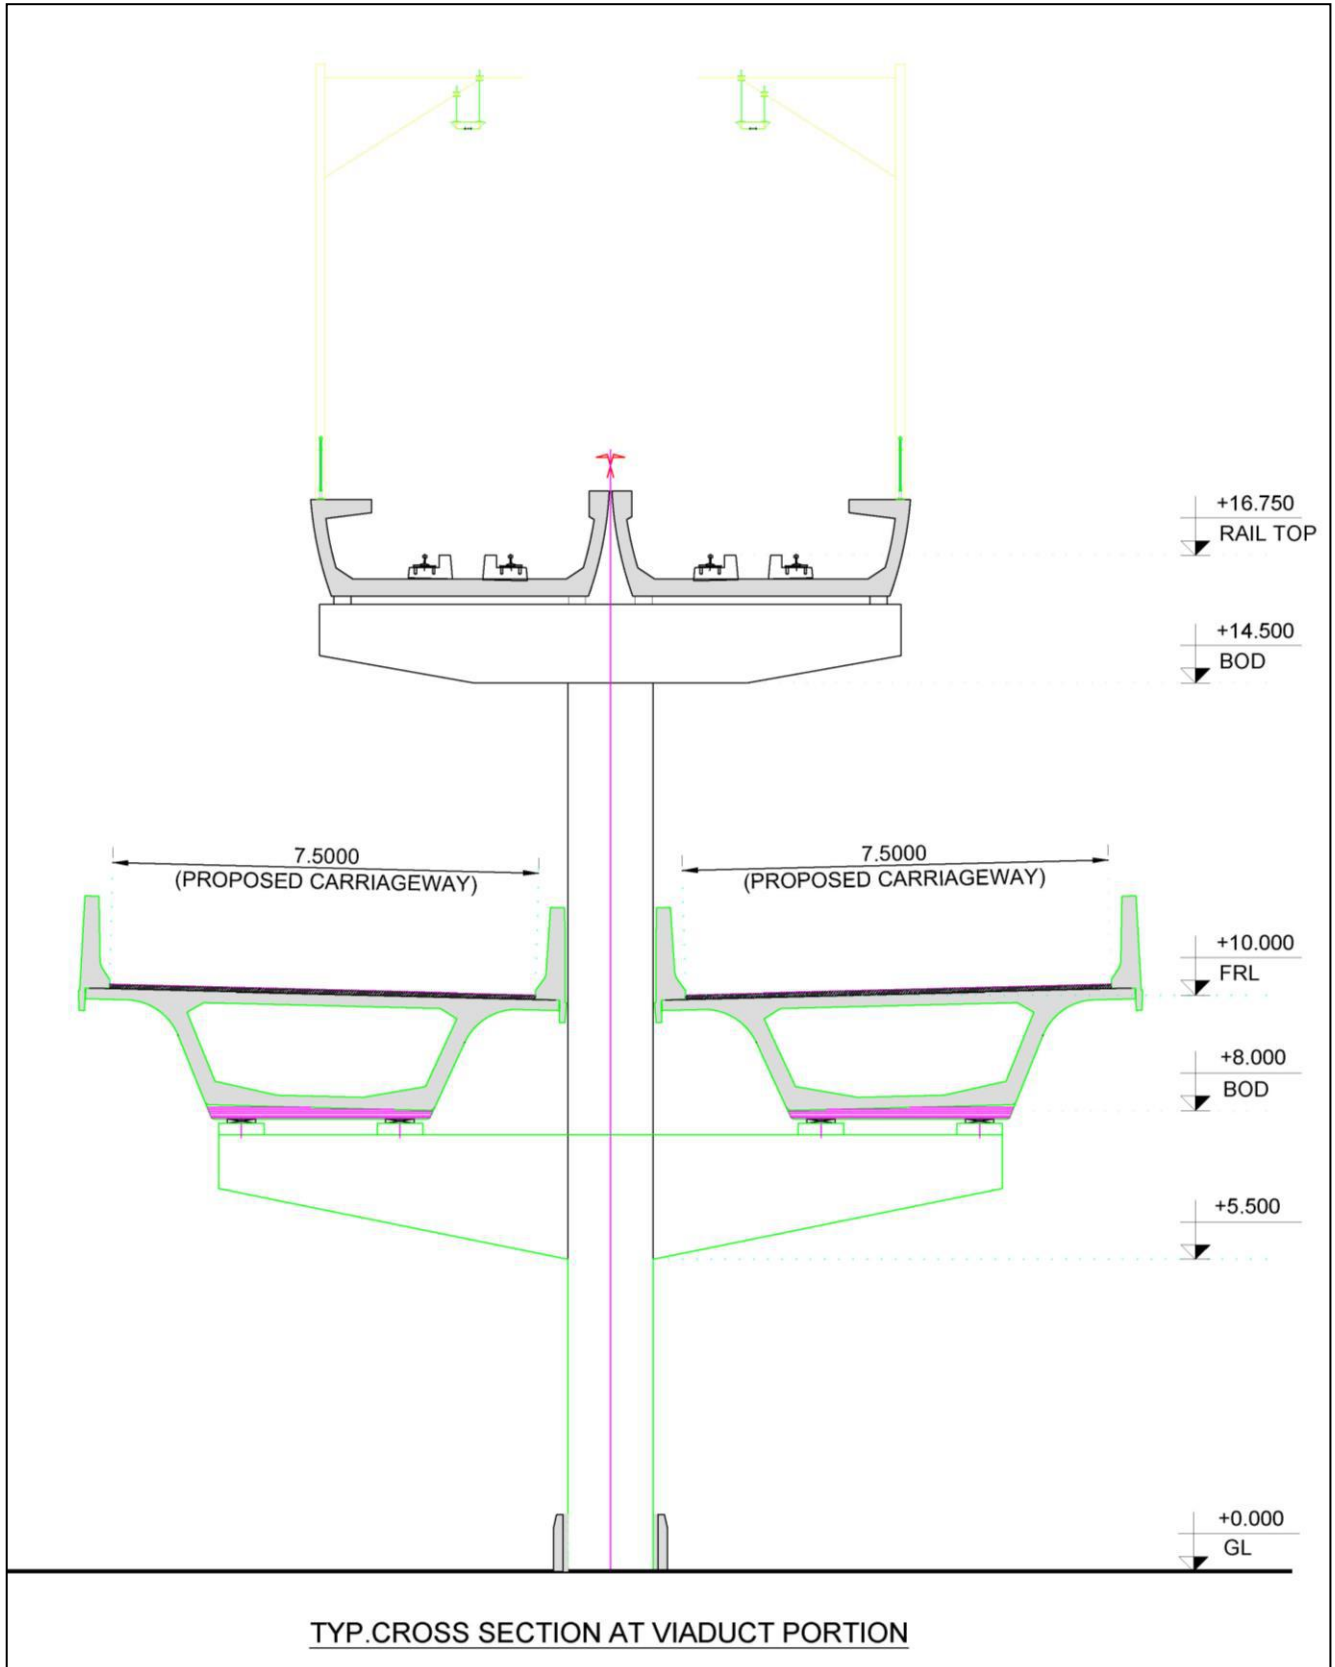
AGREED CROSS SECTION OF DOUBLE ELEVATED METRO CUM ELEVATED ROAD
